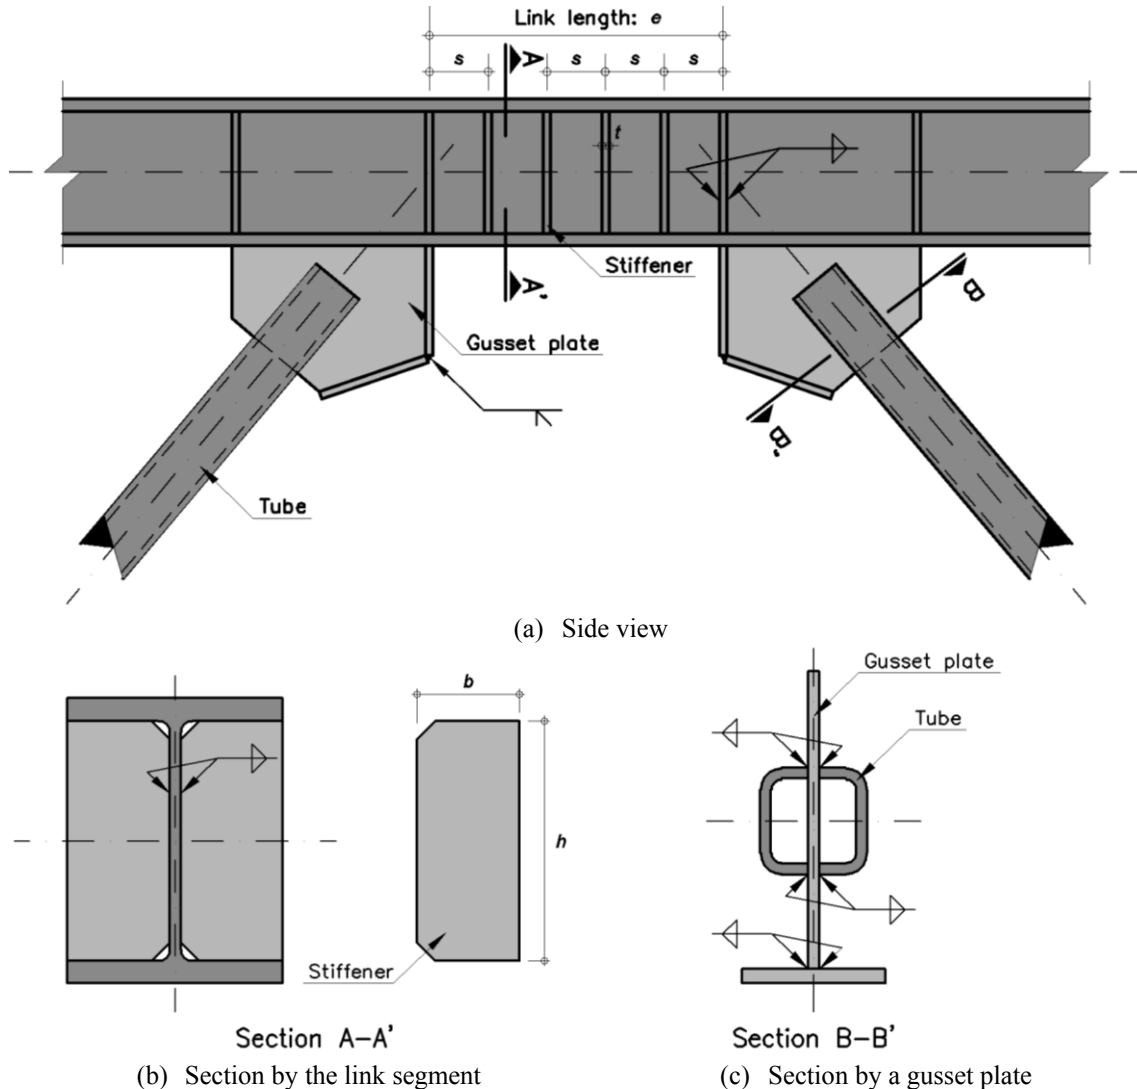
Connection between two chevron braces and one beam of an EBF building
